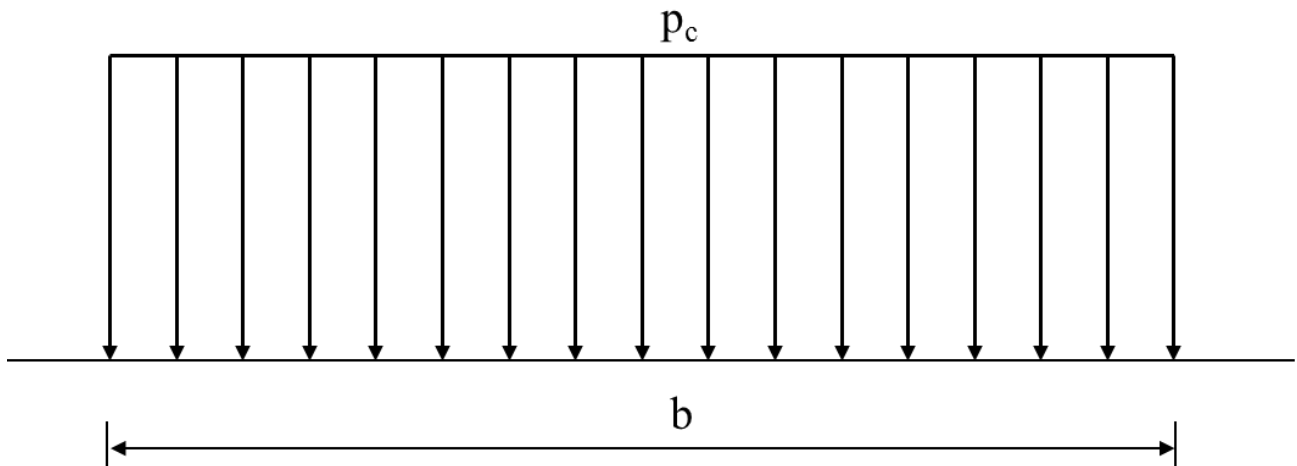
Distributed Vertical Stress above the Culvert under a Rigid Pavement
